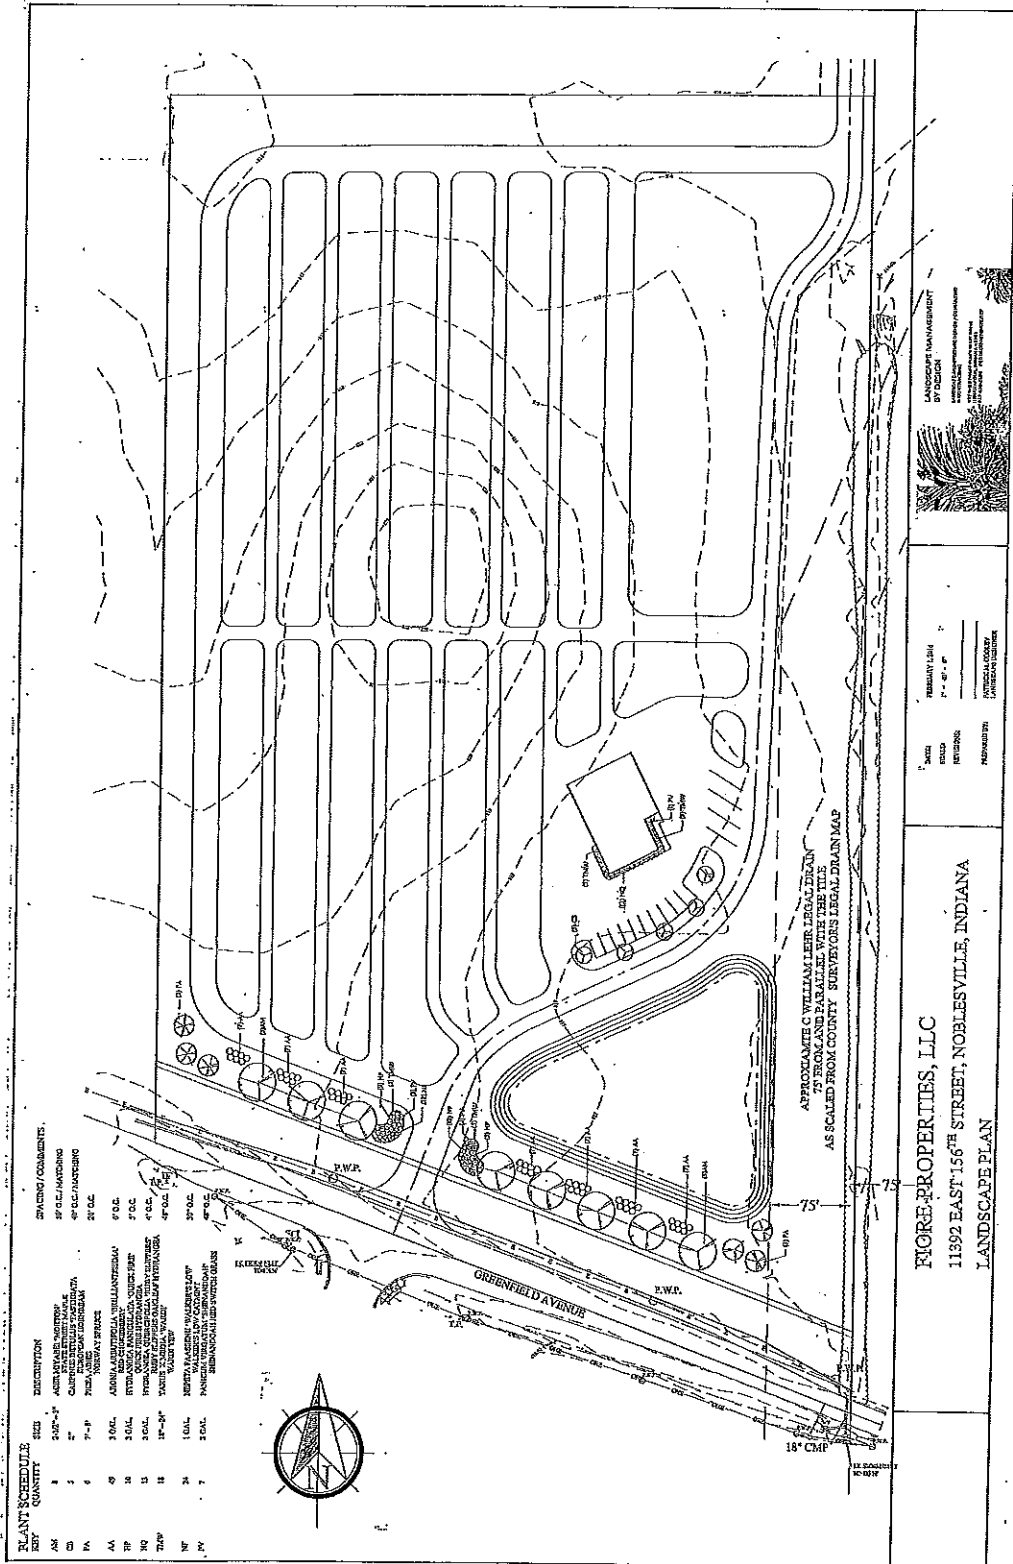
PRELIMINARY DEVELOPMENT PLAN
